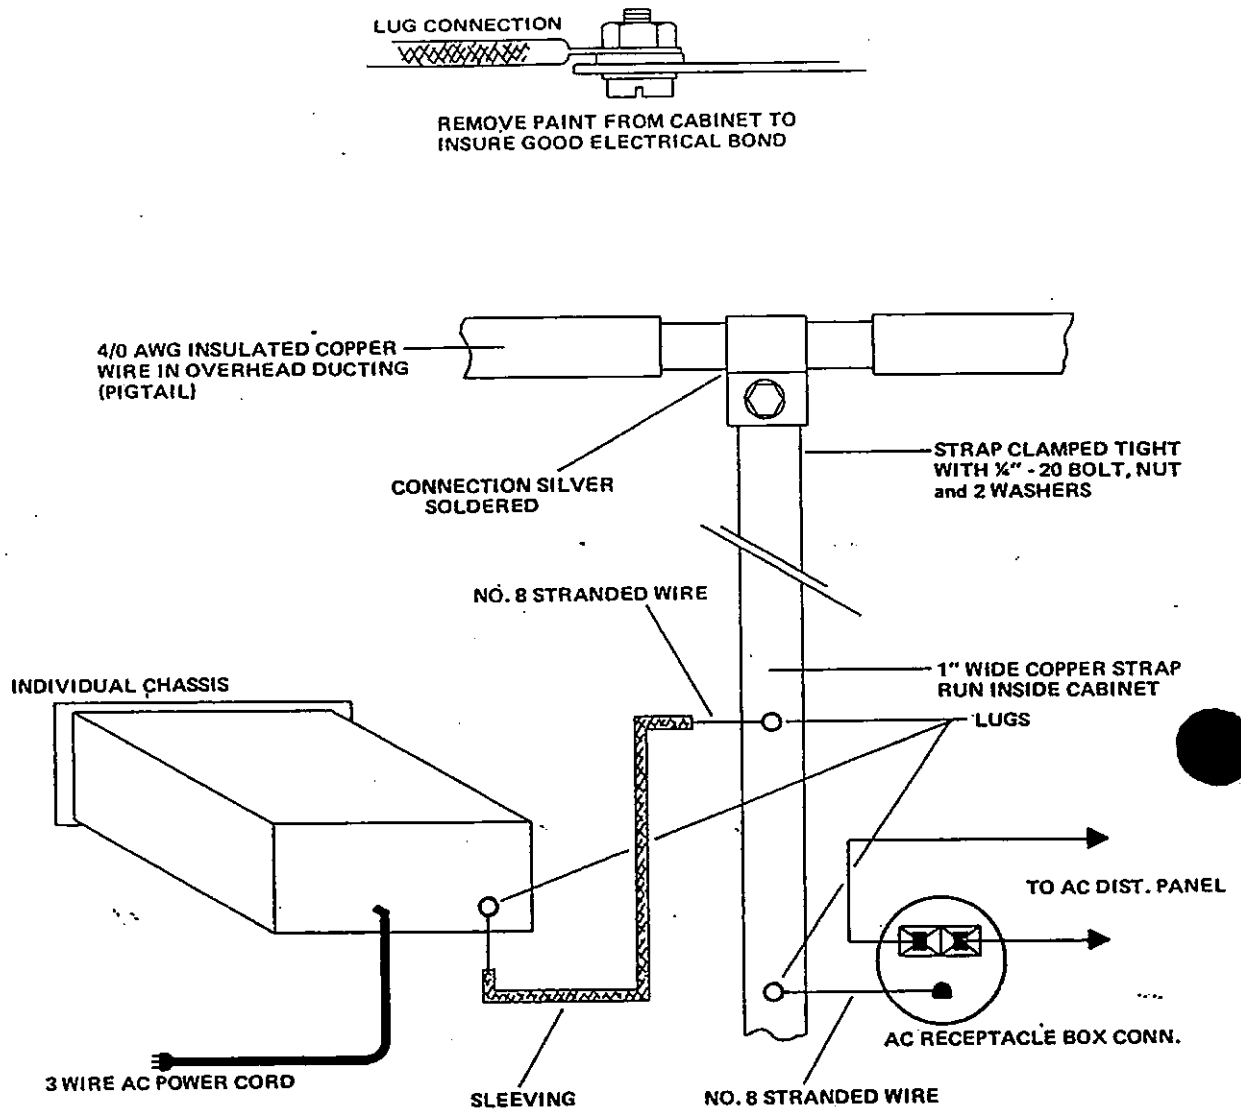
Chassis and Cabinet Grounding Details for Overhead Ducting
